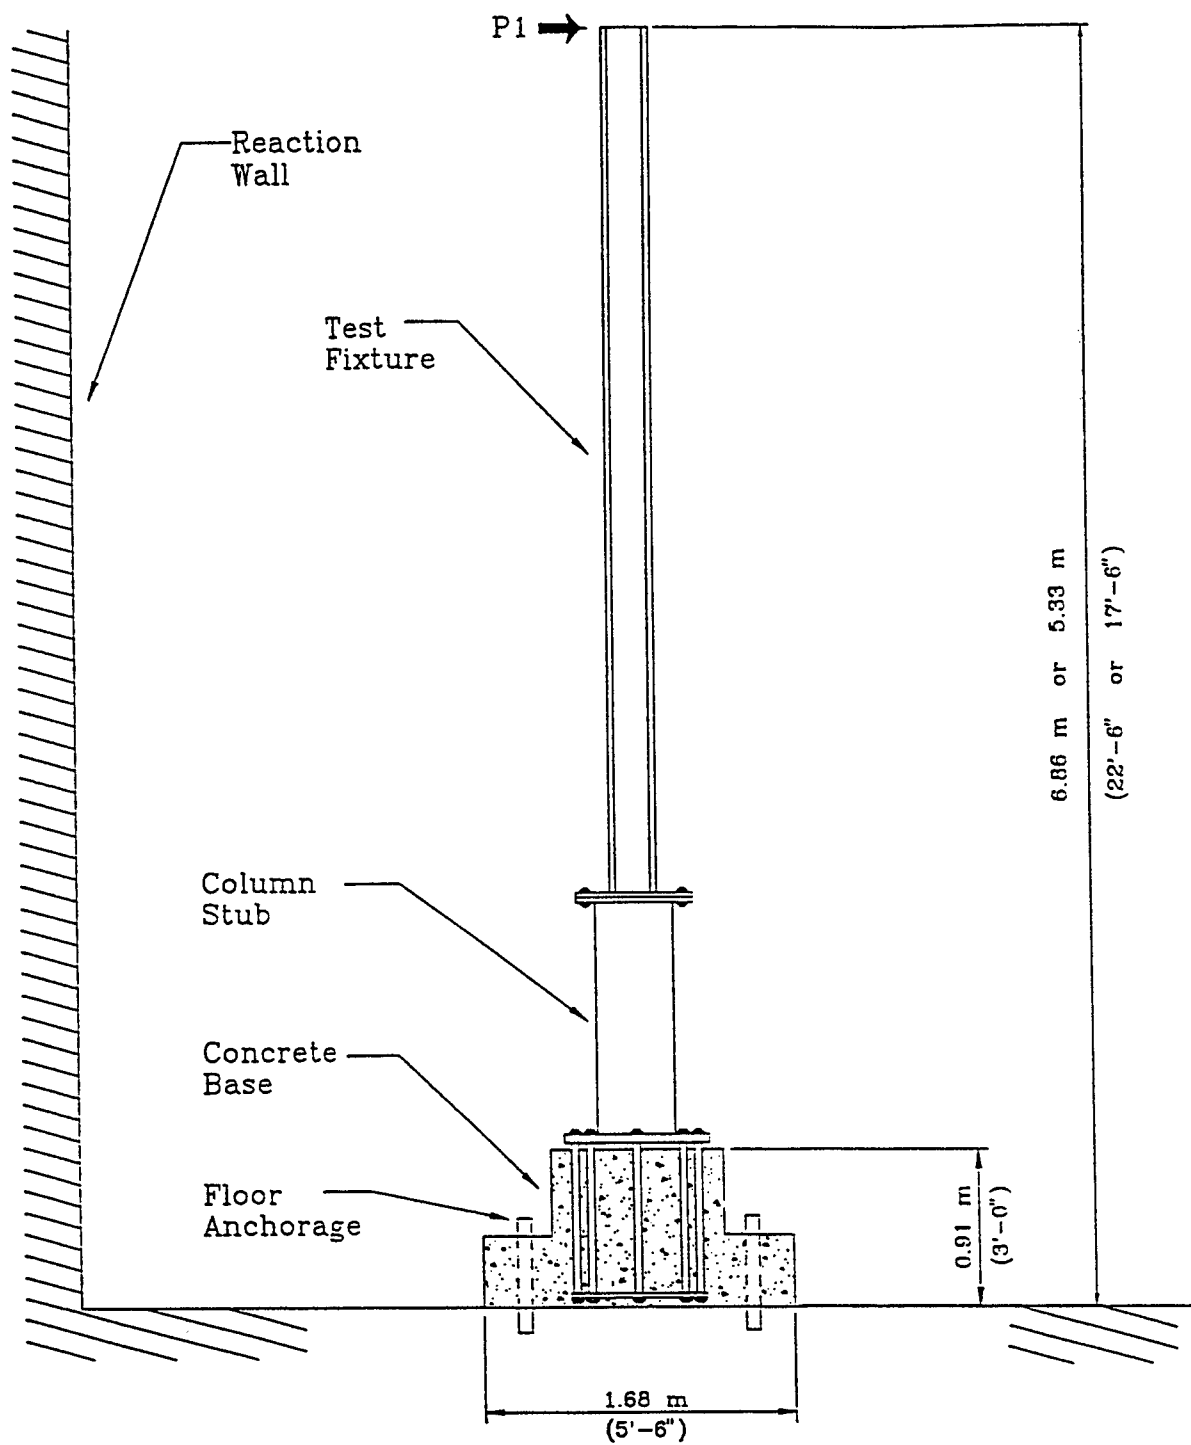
(a) - Anchor Bolt Group Test Setup (Elevation)
